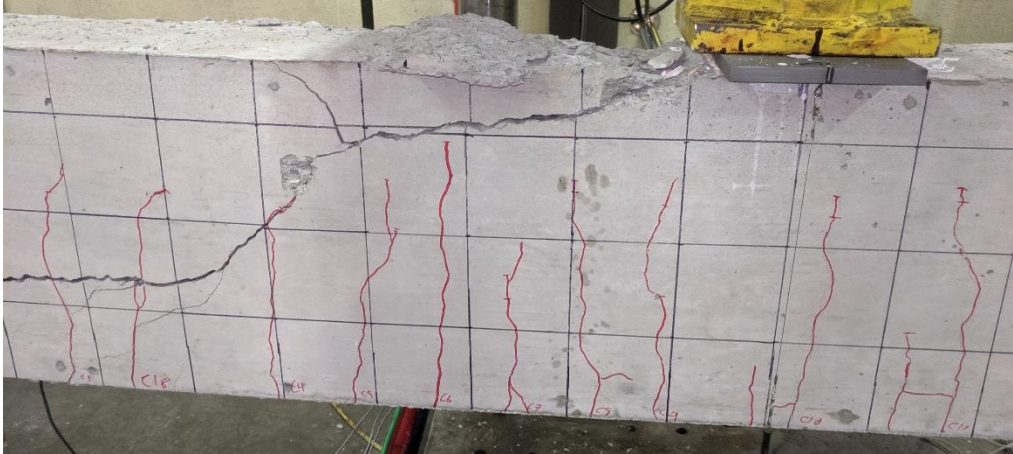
BM 8.5-N: Crack patterns at failure
